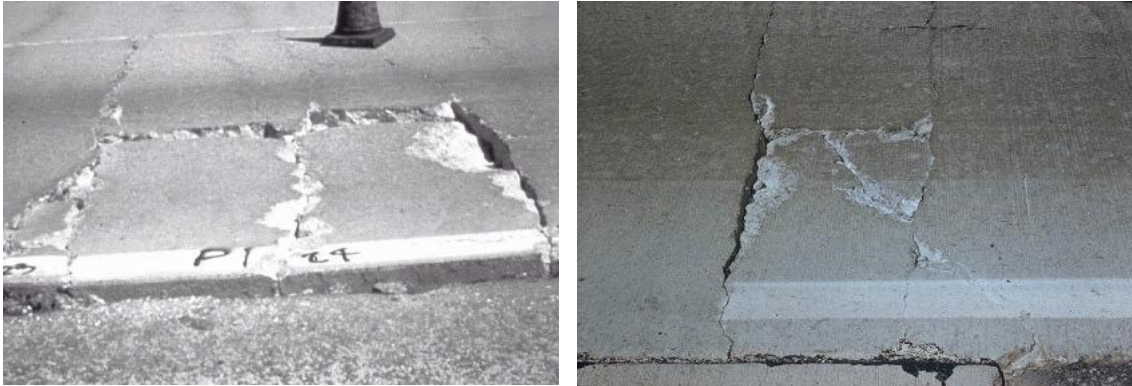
EXAMPLES OF PUNCHOUT DISTRESS (PAVEMENT INTERACTIVE, 2014 B)
